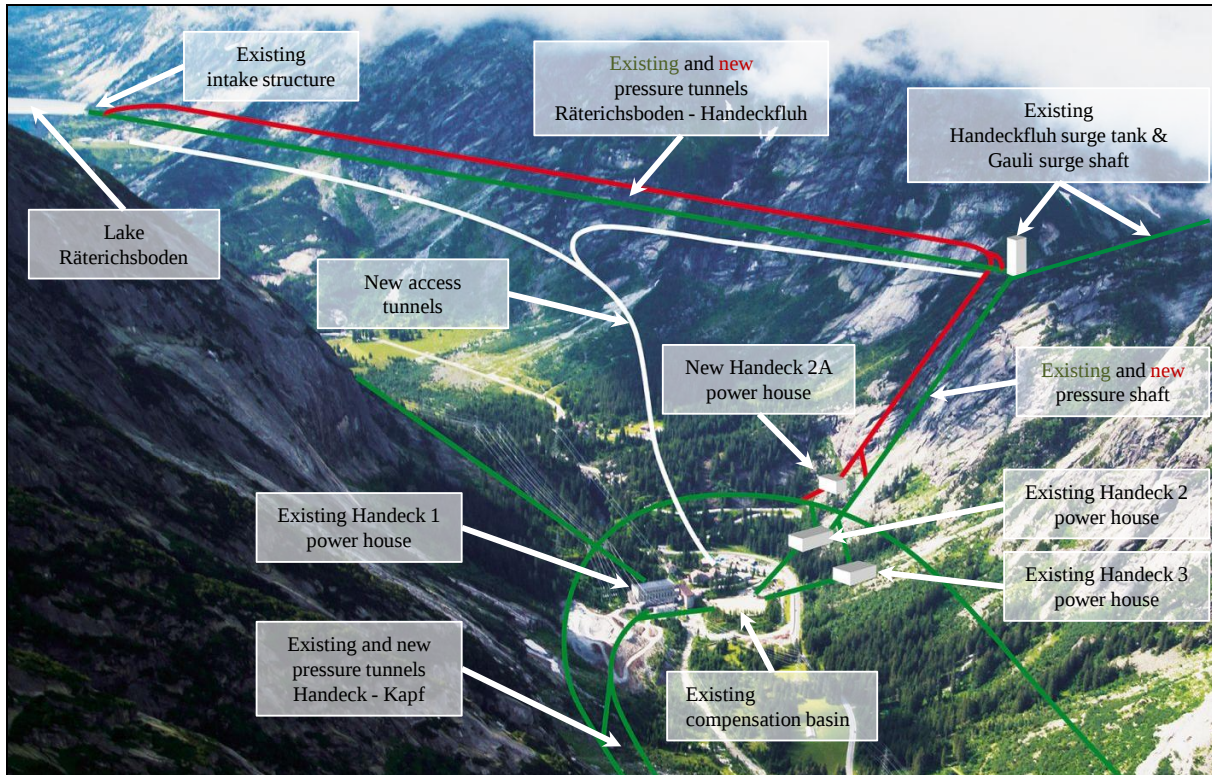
Overview of the Handeck 2 enhancement project (--- existing and --- new elements)
